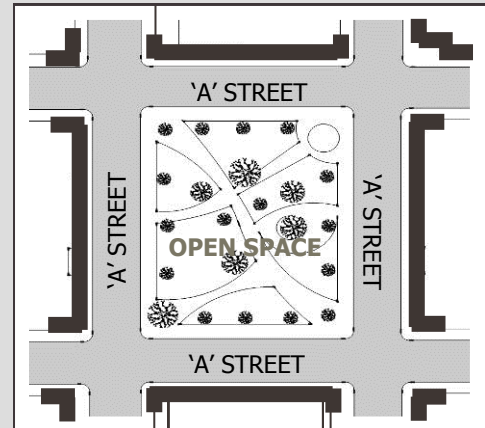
The facades of buildings that address open space will be treated like 'A' frontages, incorporating the highest level of architecture, articulation and use of materials.
